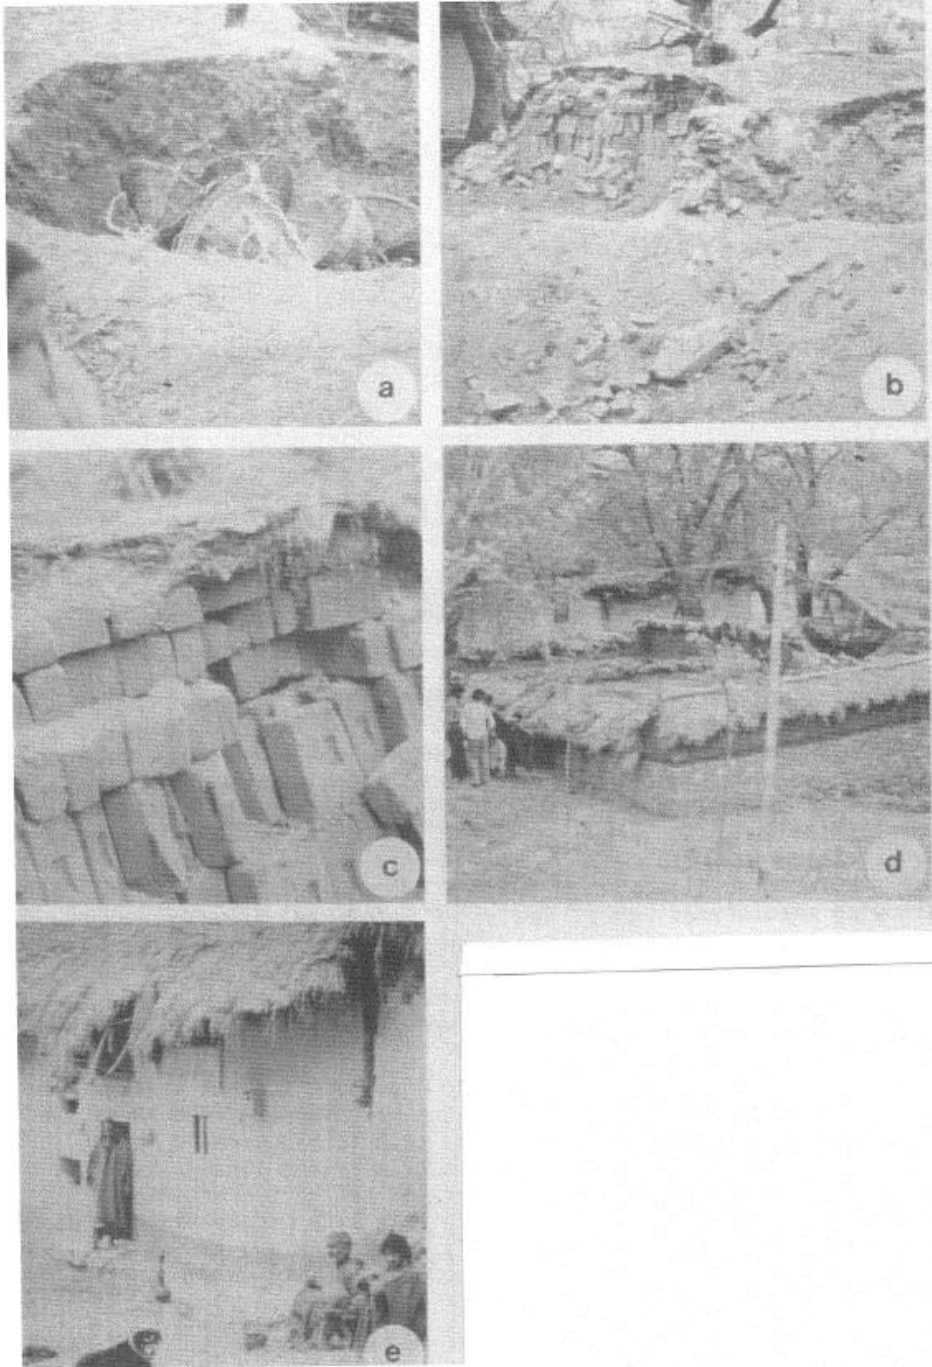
Primitive brick manufacturing in India. (a) Manual digging of clay with 50m of the building site; (b) Simple kiln adjacent to the building site; (c) Detailed view of bricks at top of the kiln set-up; (d) Brick masonry wall construction on top of stone masonry foundation. Note the straw cover when construction stopped. (e) Typical exterior plaster parging and/or whitewash.
